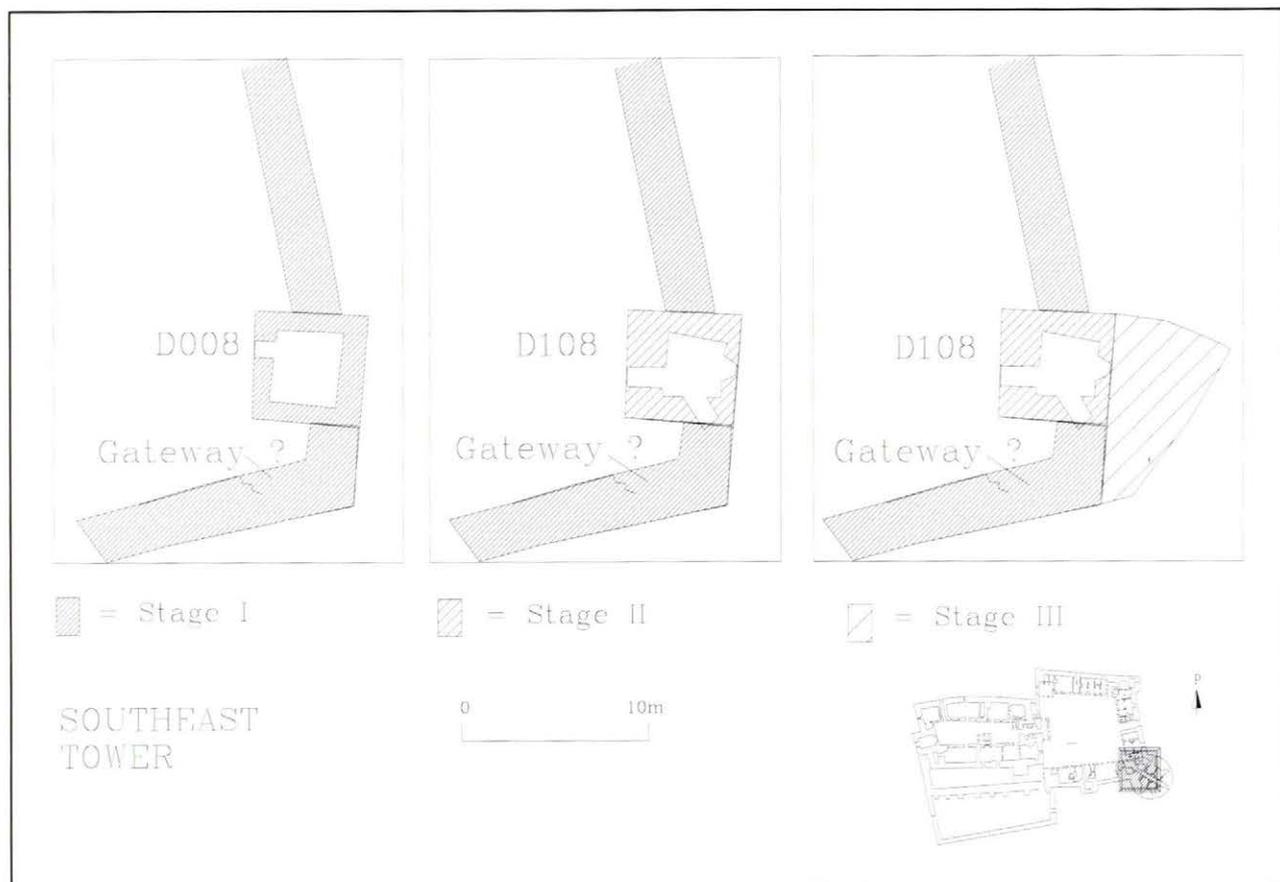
The east outer bailey of Turku Castle. History of construction of the older southeast tower and its connections with the south wall. (Illustration by K. Uotila)
